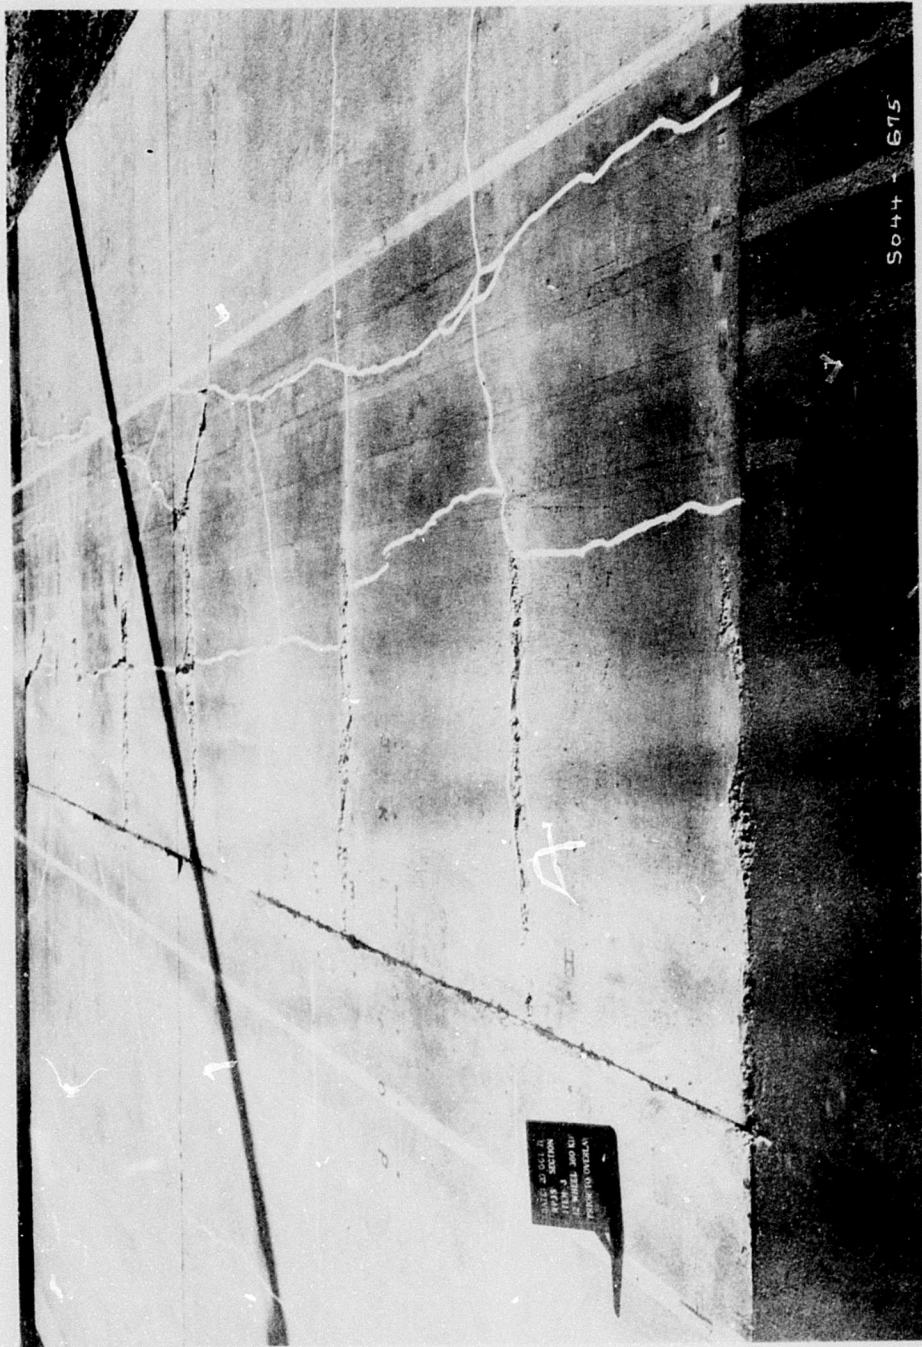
Item 3, 360-kip, 12-wheel-assembly lane after 688 coverages.
